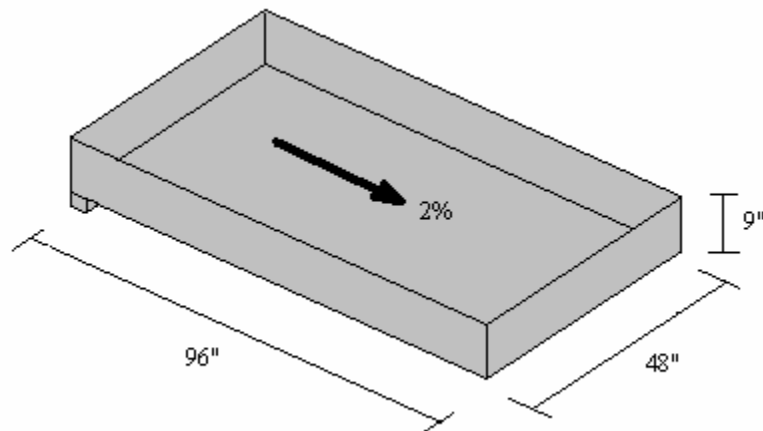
Schematic of formwork constructed to verify casting potential of ECC
